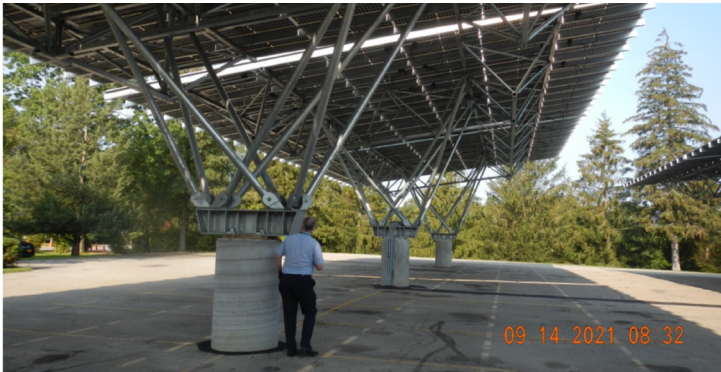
Smaller canopies can be supported by wide concrete piers. (Photo credit: Lindsay Audin)
